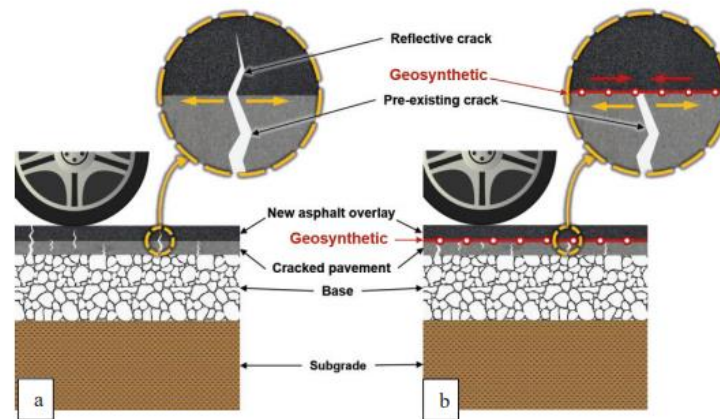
Reduction of Reflective Cracks in Asphalt Overlays [2]
